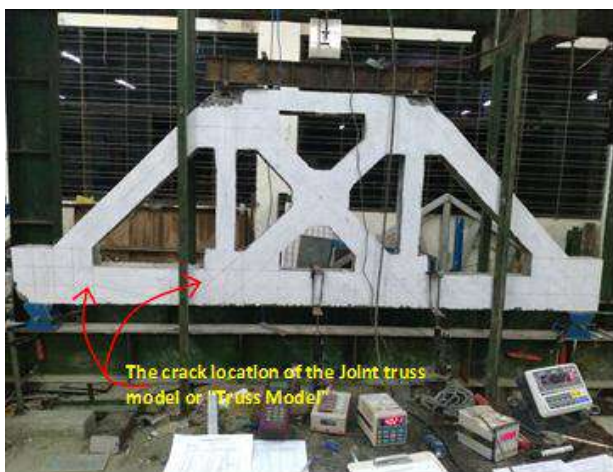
The crack pattern of the joint truss model or "Truss Model"
